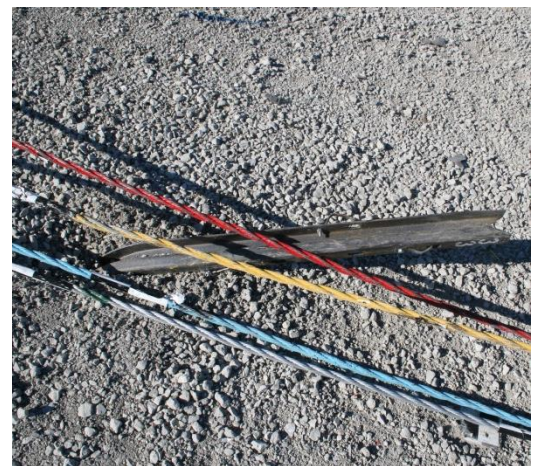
Example System Damage, Brass Rods, Test No. MWP-6
